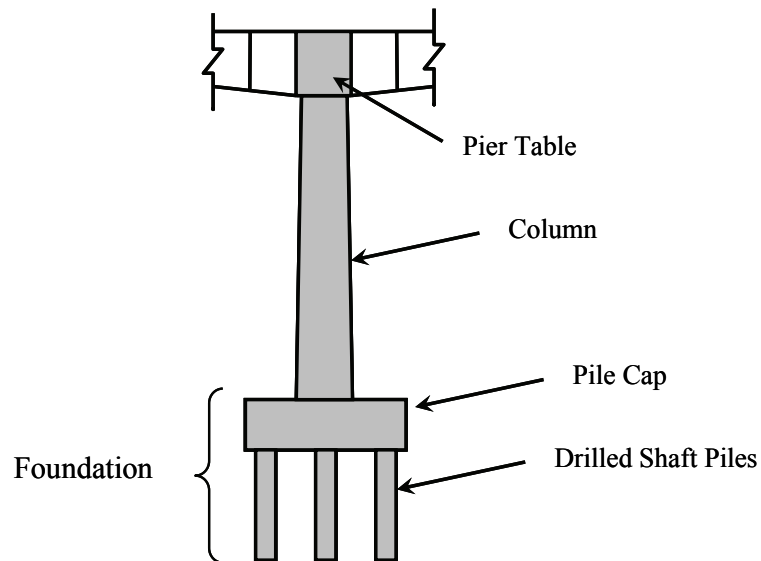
Elements of a Typical Segmental Bridge Pier
